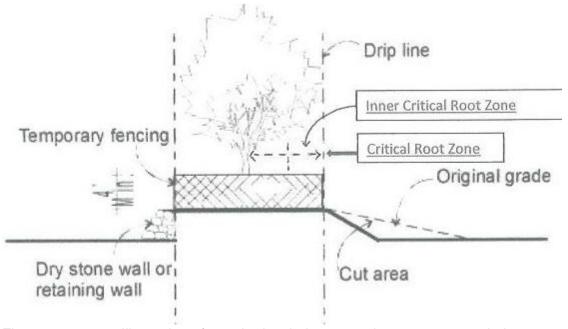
Illustration of standard techniques used to protect trees during construction.
